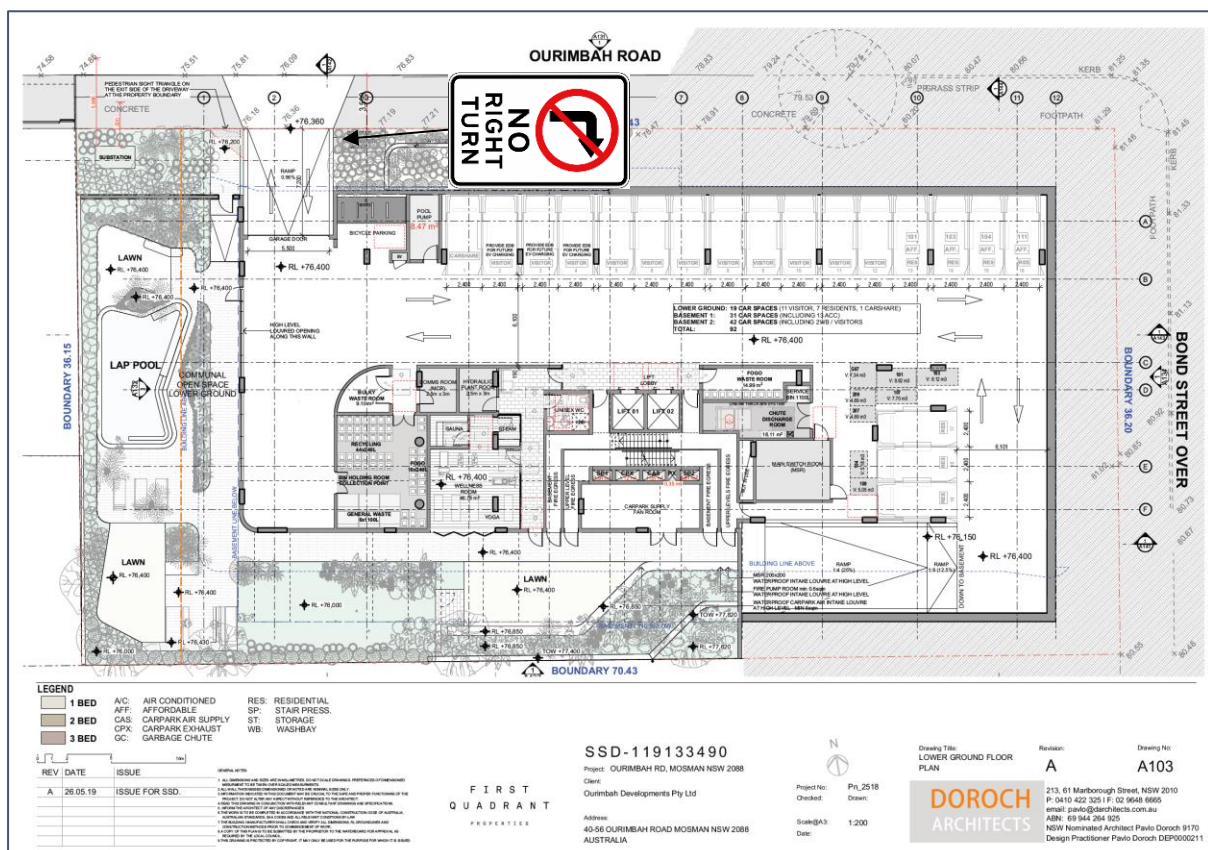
Proposed Lower Ground Floor Level (Source: Doroch Architects)
